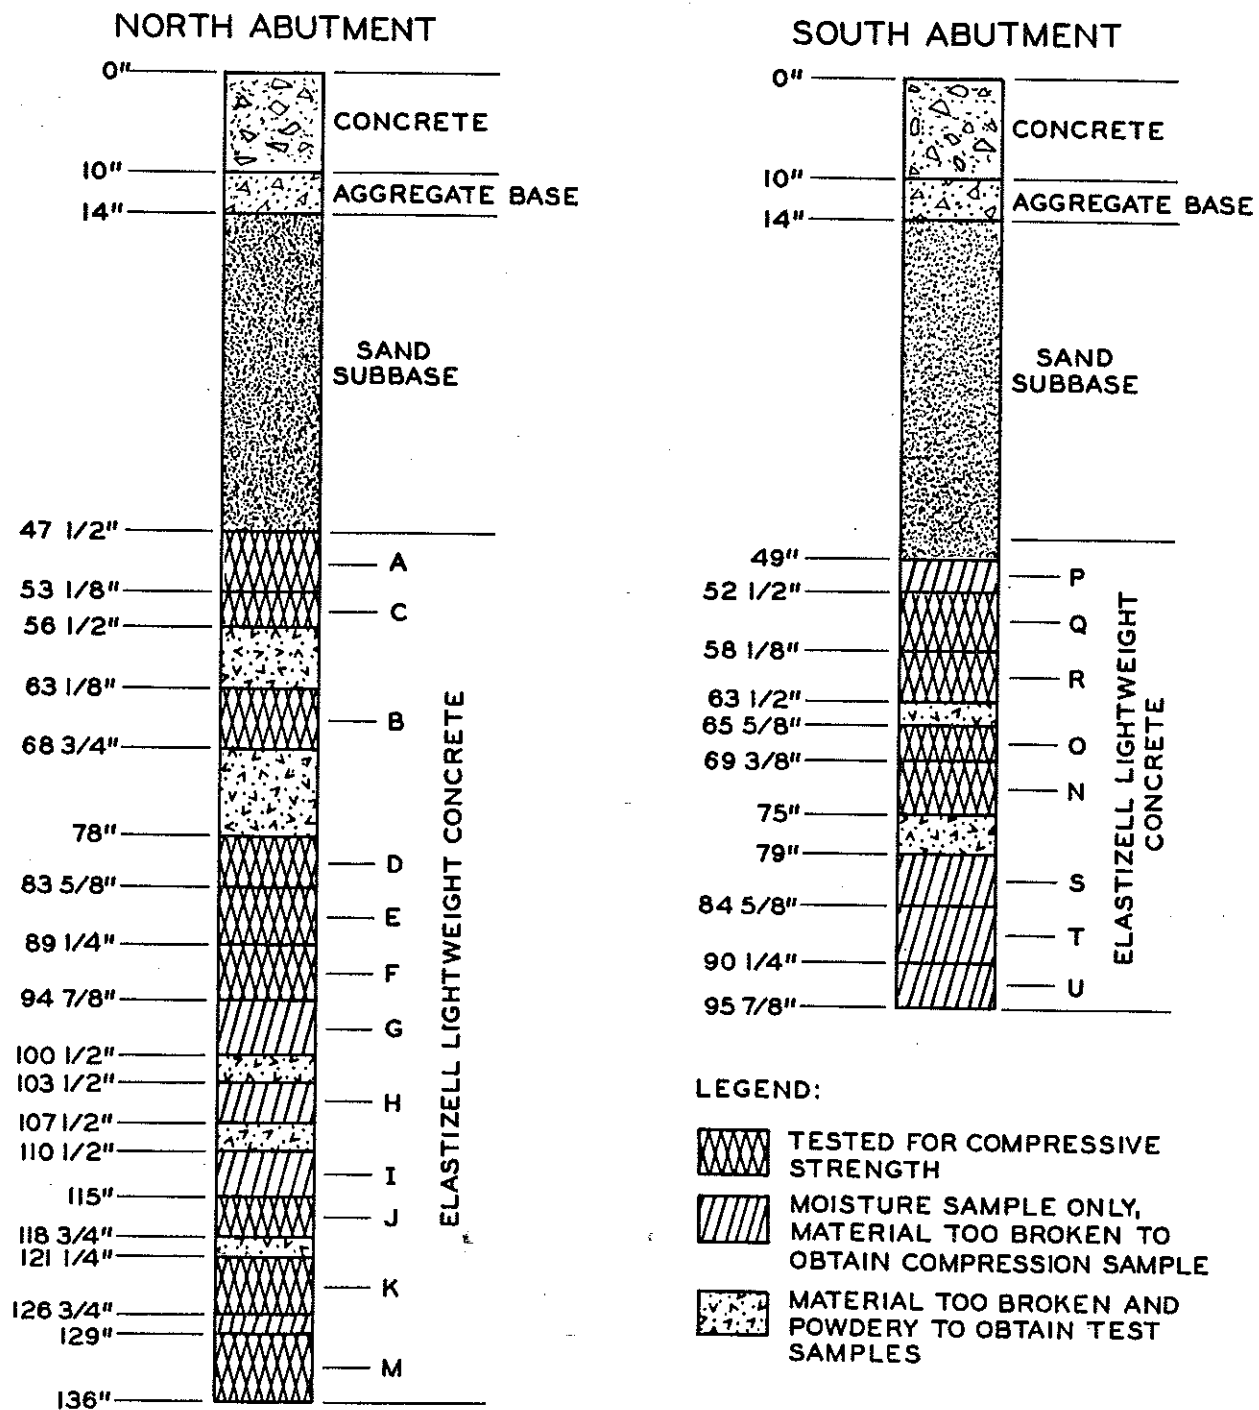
Profile of the north and south approach abutments of the M 29 Pine River bridge (not to scale).
